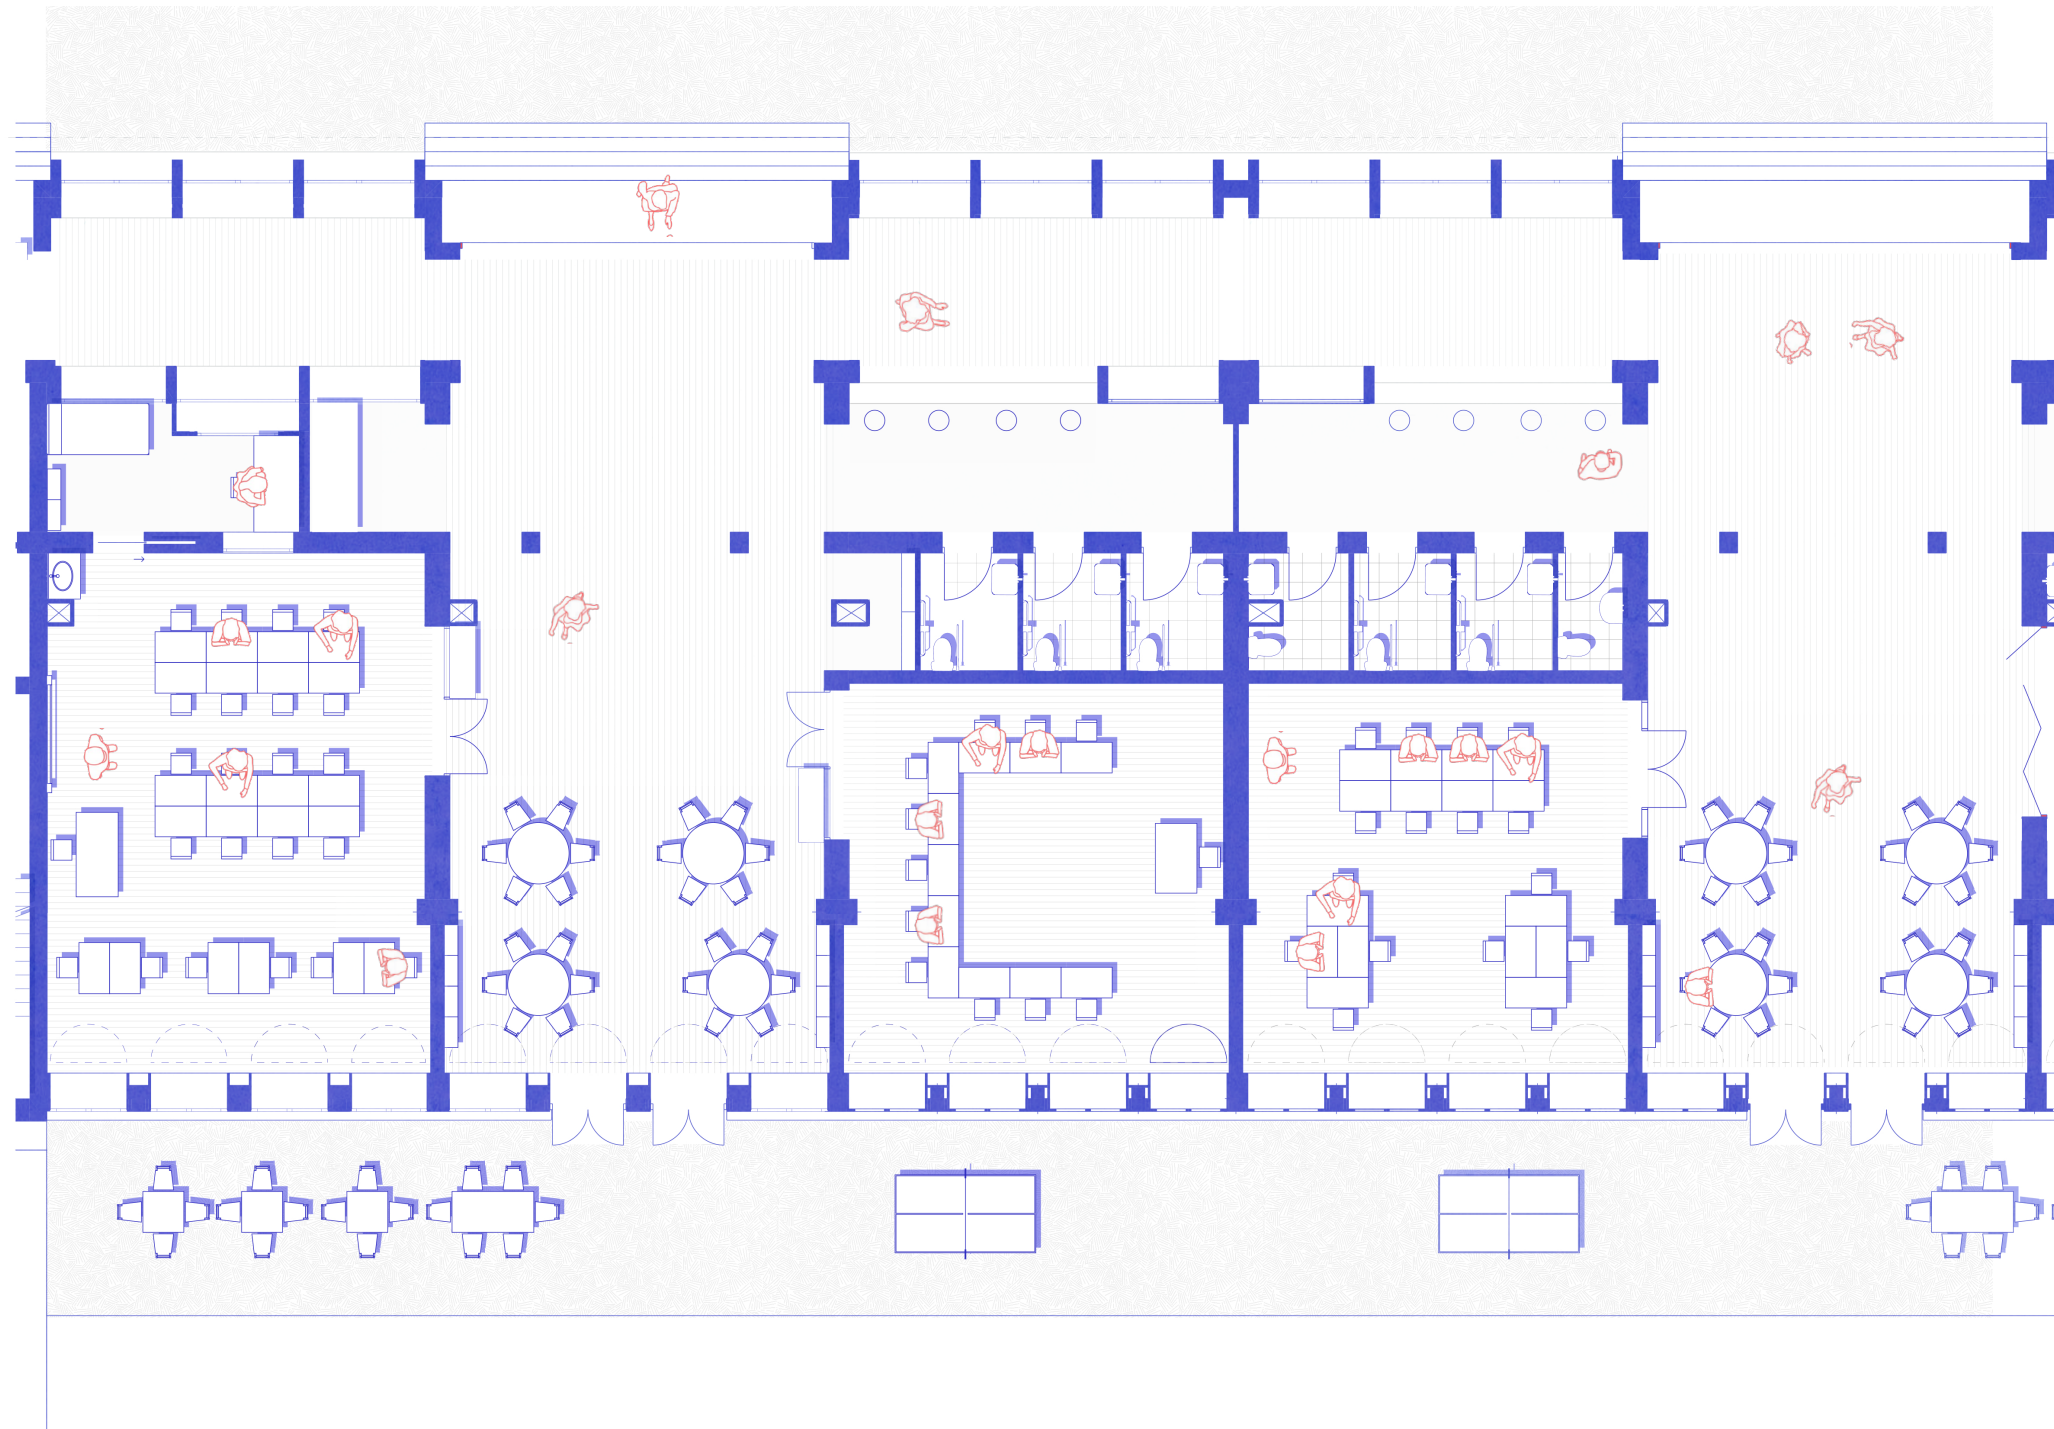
Education center, zoomed-in plan and design concepts (Ground floor)
